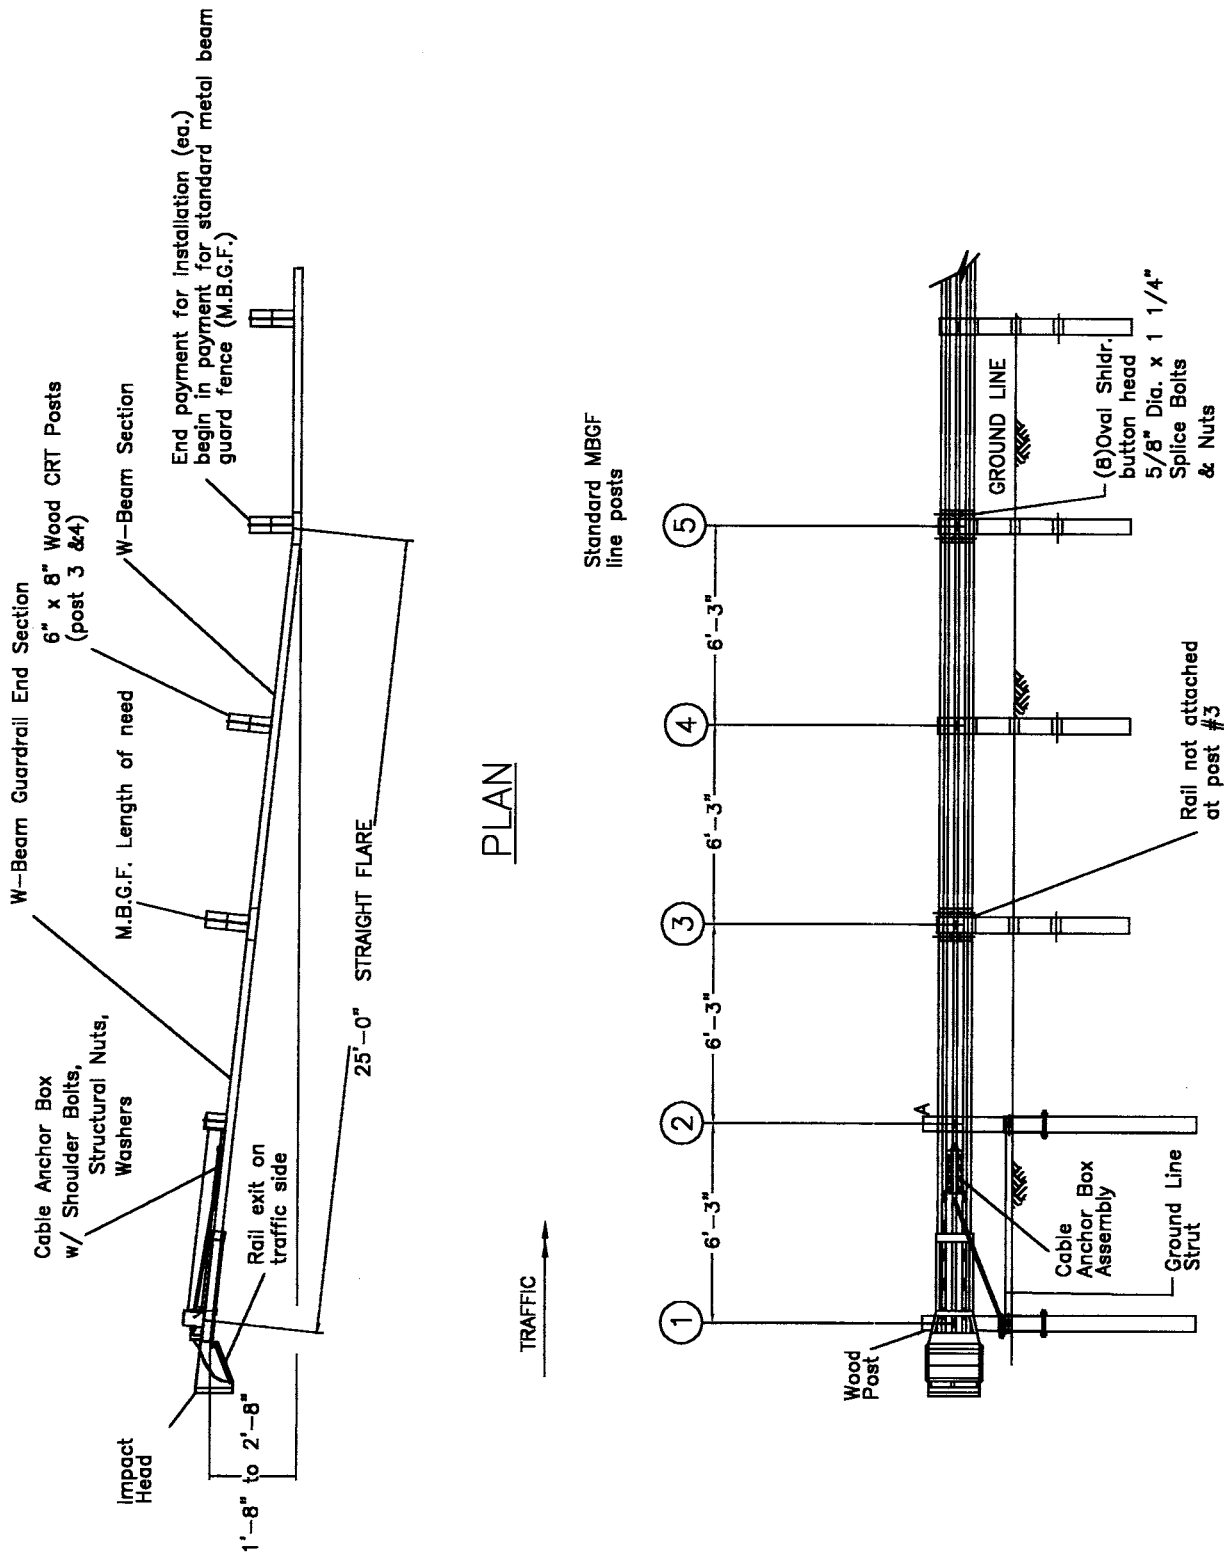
Plan and Elevation View of Test Level 2 FLEAT System
